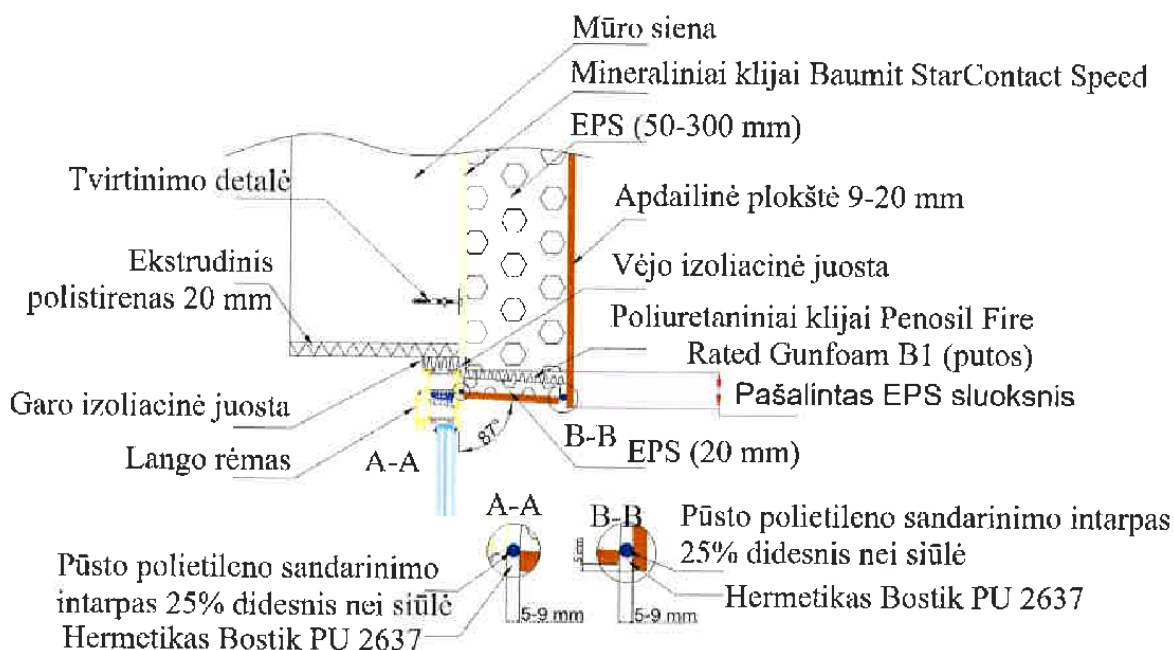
Installation diagram of a window sill on a façade. Front view.
